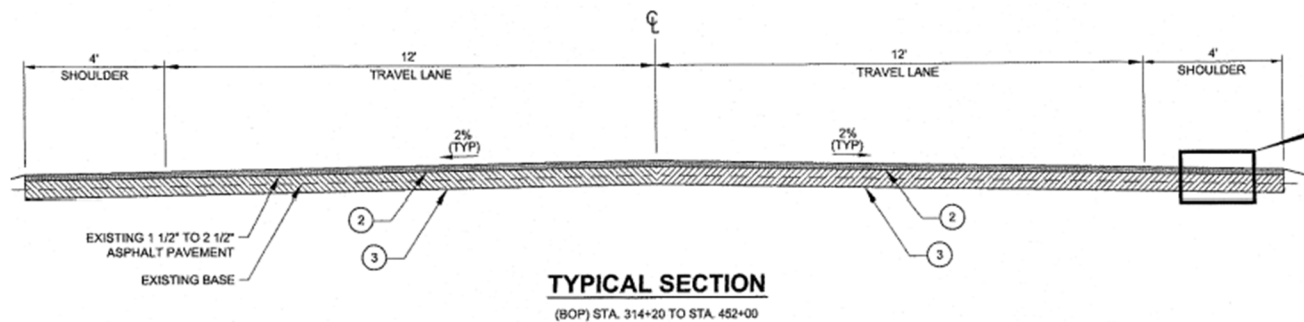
Typical Section – North Douglas Highway from West of Fish Creek Road to Peterson Creek Trail
